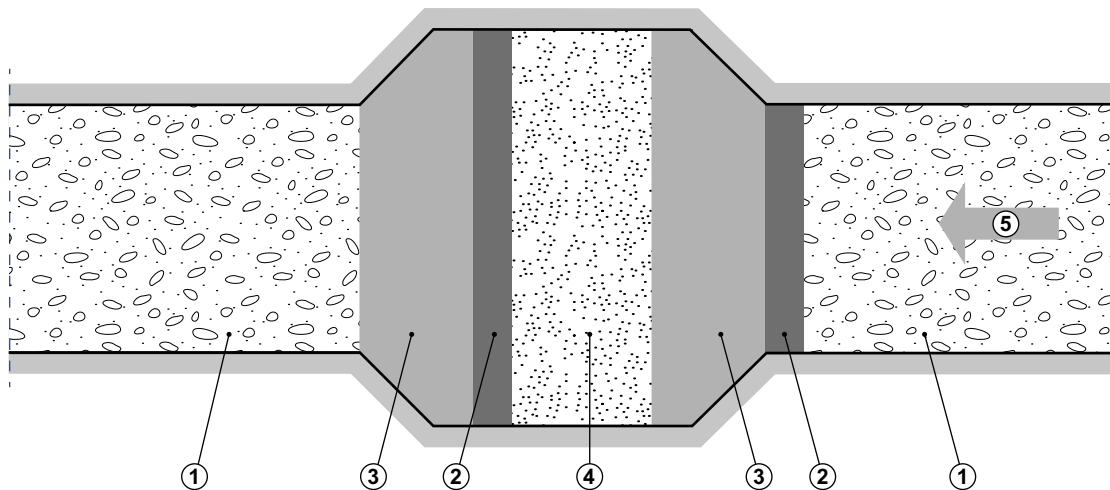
Schematic reference design of the access tunnel plug. Key to numbering: 1) Macadam backfill 2) Constraining concrete wall 3) Concrete 4) Bentonite 5) Working direction.
